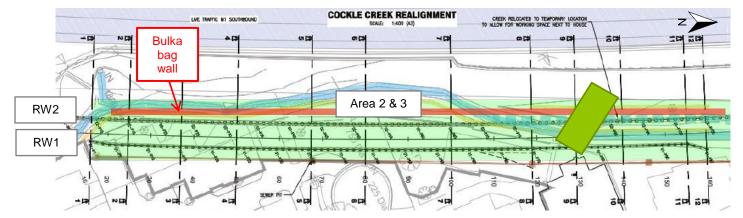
, first section of Cockle creek to be realigned, to enable piling and FRP works to commence, noting RW01, RW02, the temporary crossing and the bulka bag wall adjacent to the piles
